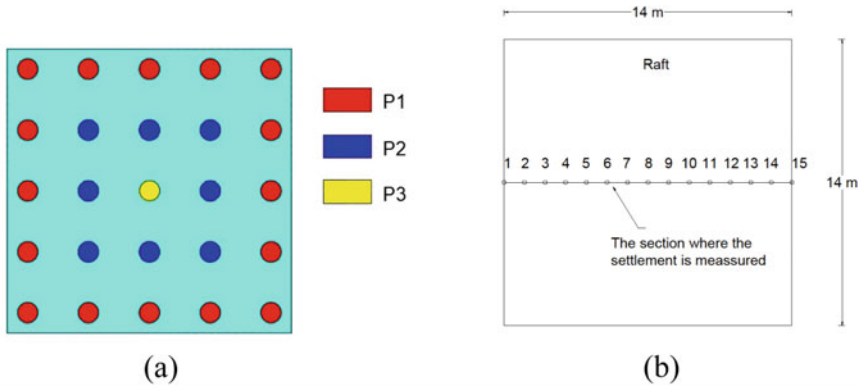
Plan view of raft foundation indicating a positions of the piles b locations of the settlements are measurement
